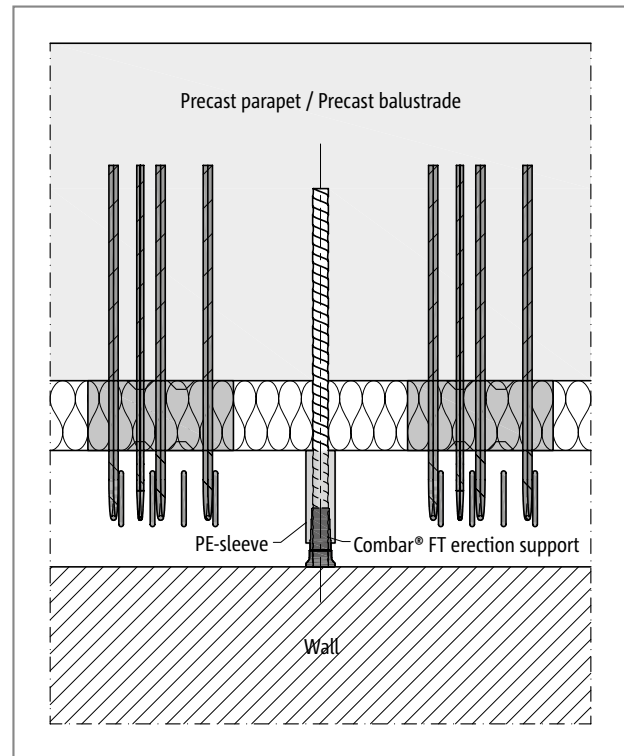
Schöck Combar® FT erection support: Installation in a precast concrete parapet; view
